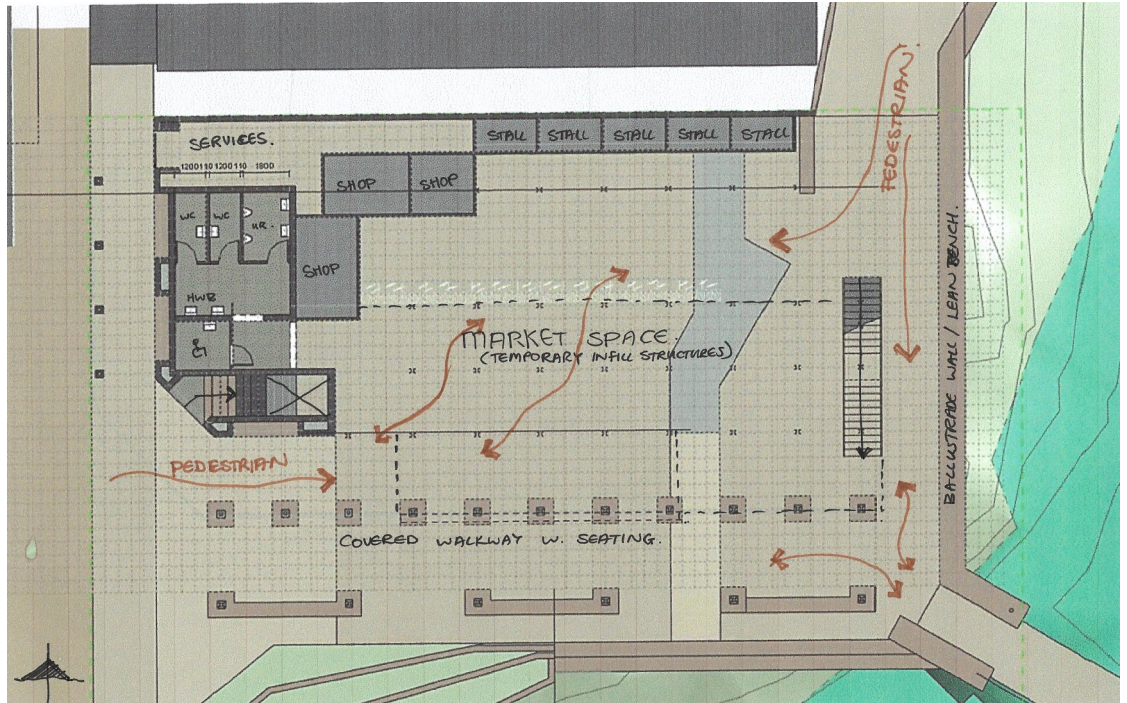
Ground Floor Plan of Market building (Author 2020)
